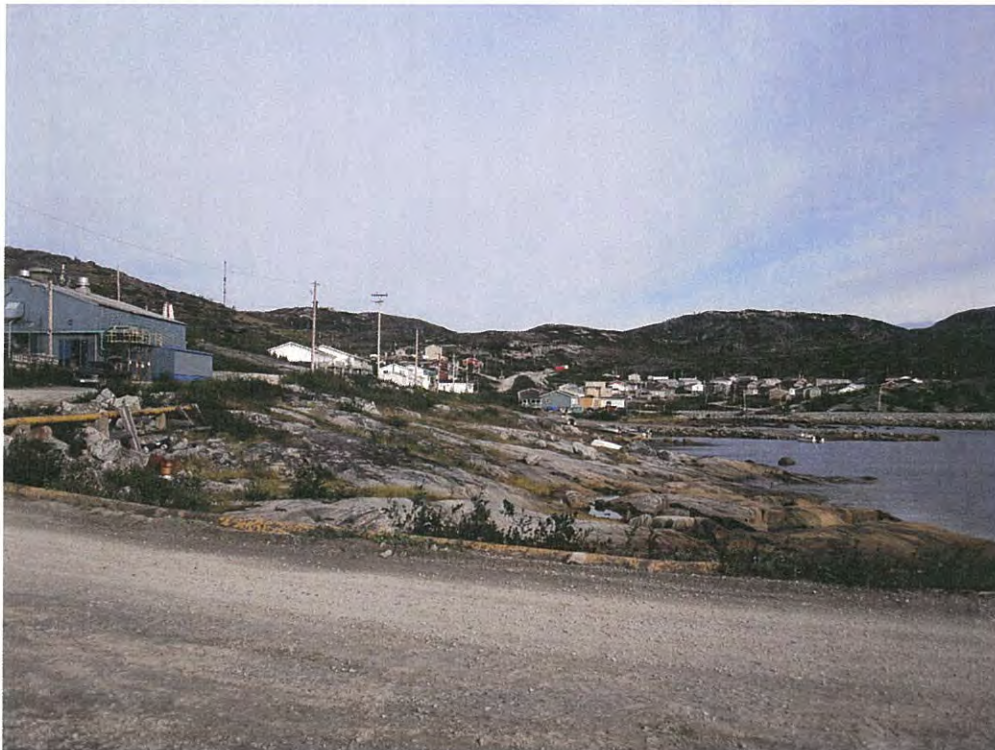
View of road, pipeline, town infrastructure and Hopedale Harbour (looking northeast)
